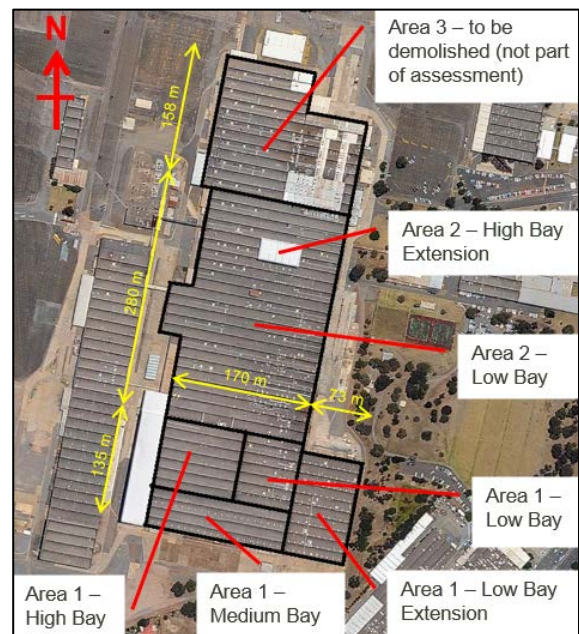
Plan view showing the extent of the building and representative heights of each bay
